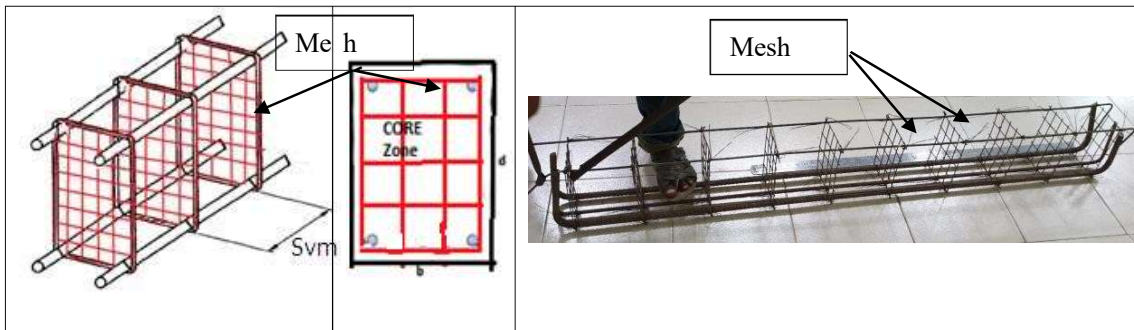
Reinforcement cage with Mesh as transverse reinforcement replacing the conventional stirrups and its cross section
